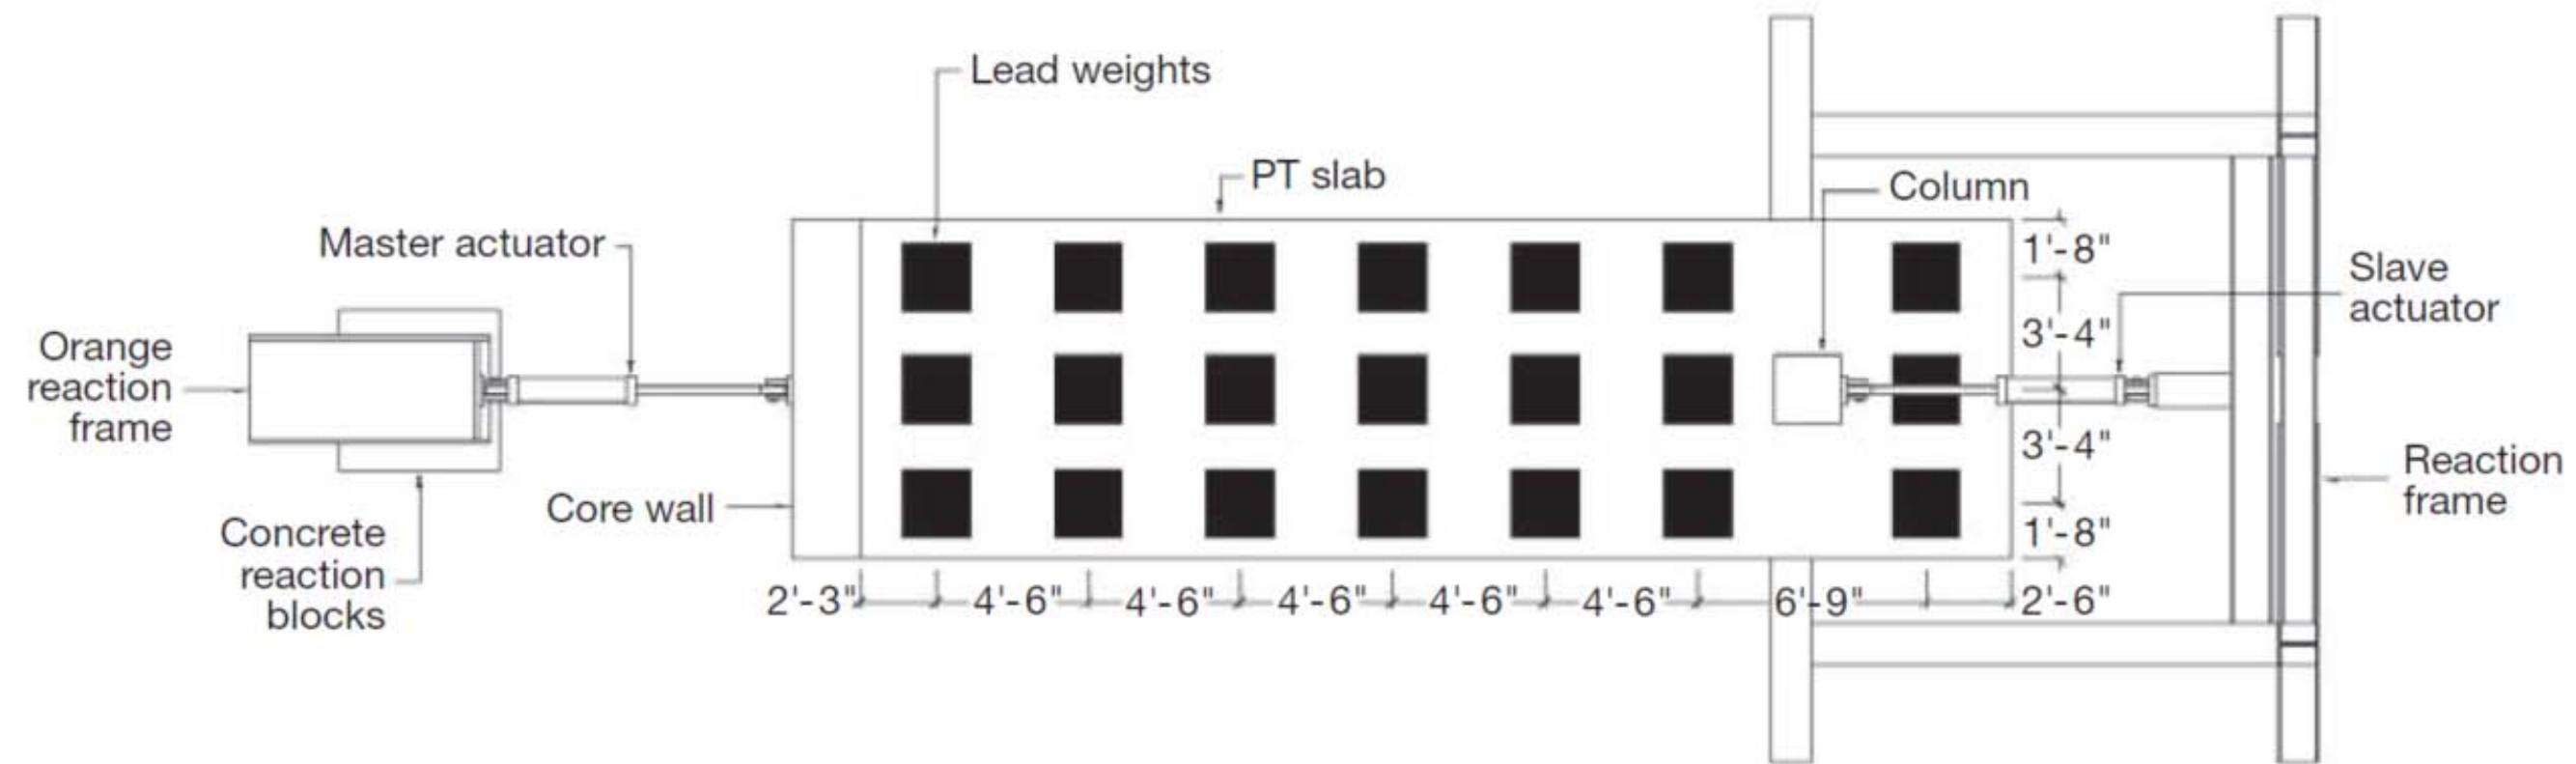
Plan of Test Set-Up Showing Superimposed Loads
